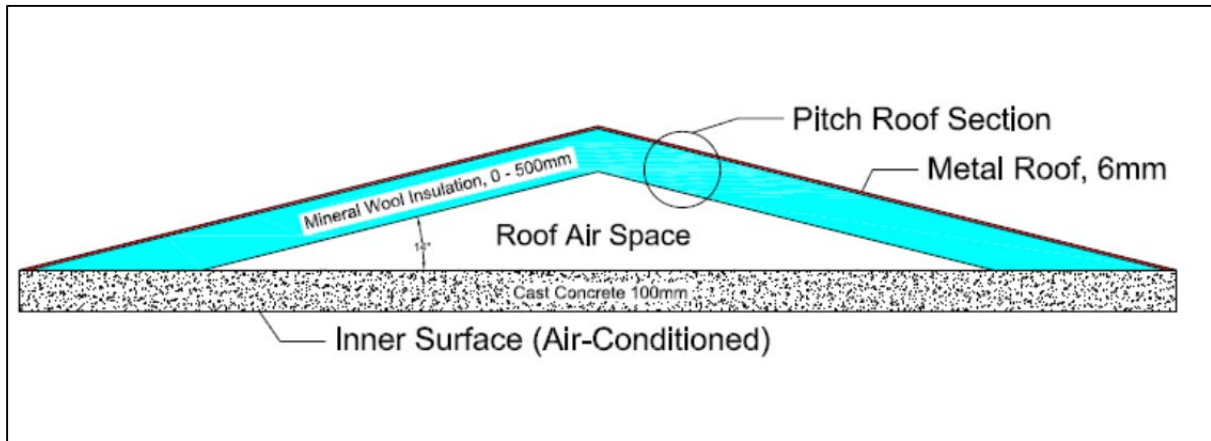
Cross-Section of a Pitch Roof Construction with Concrete as Ceiling
